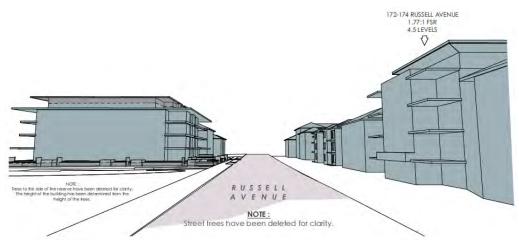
Street perspective looking west (Source: Proponent's Planning Proposal)
